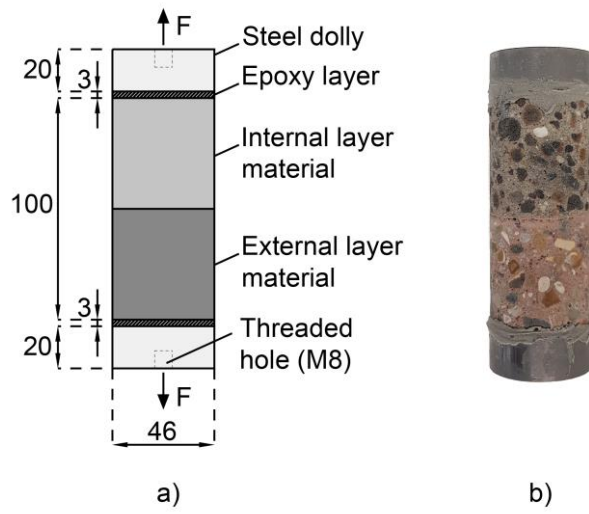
Layered specimen with glued steel dollies: (a) schematic representation and (b) photo.
